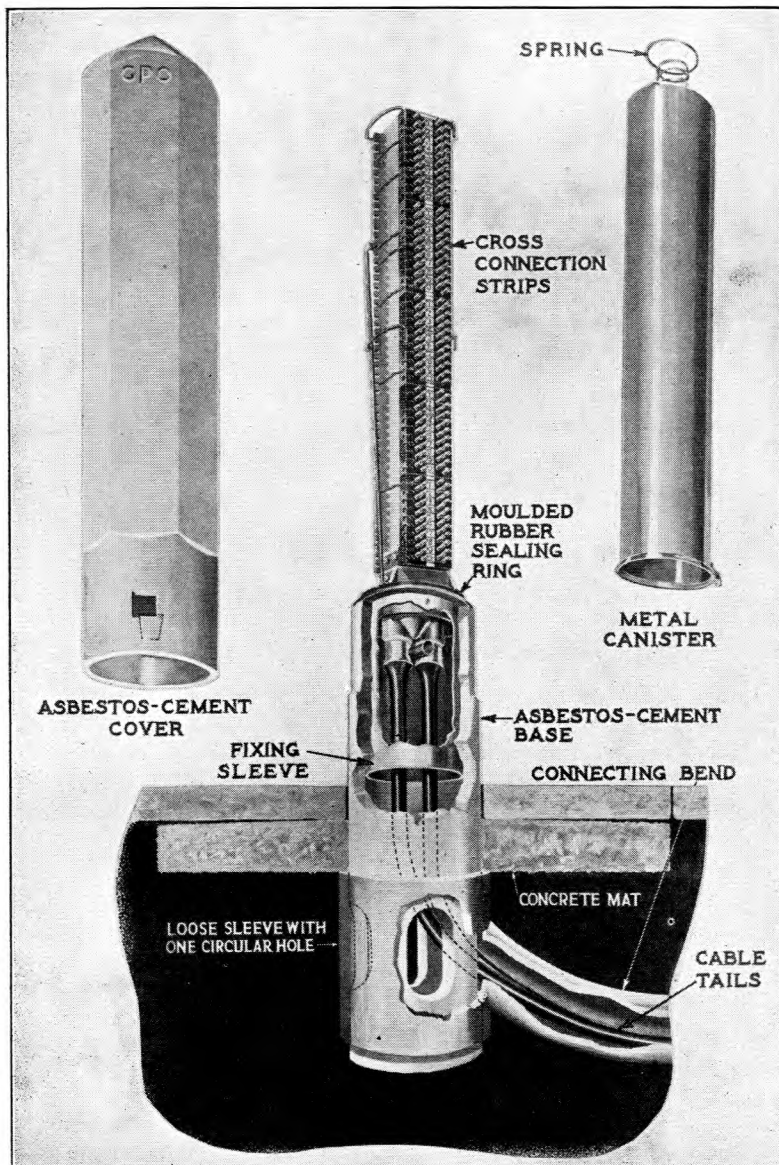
50-PAIR CROSS-CONNECTION PILLAR.
